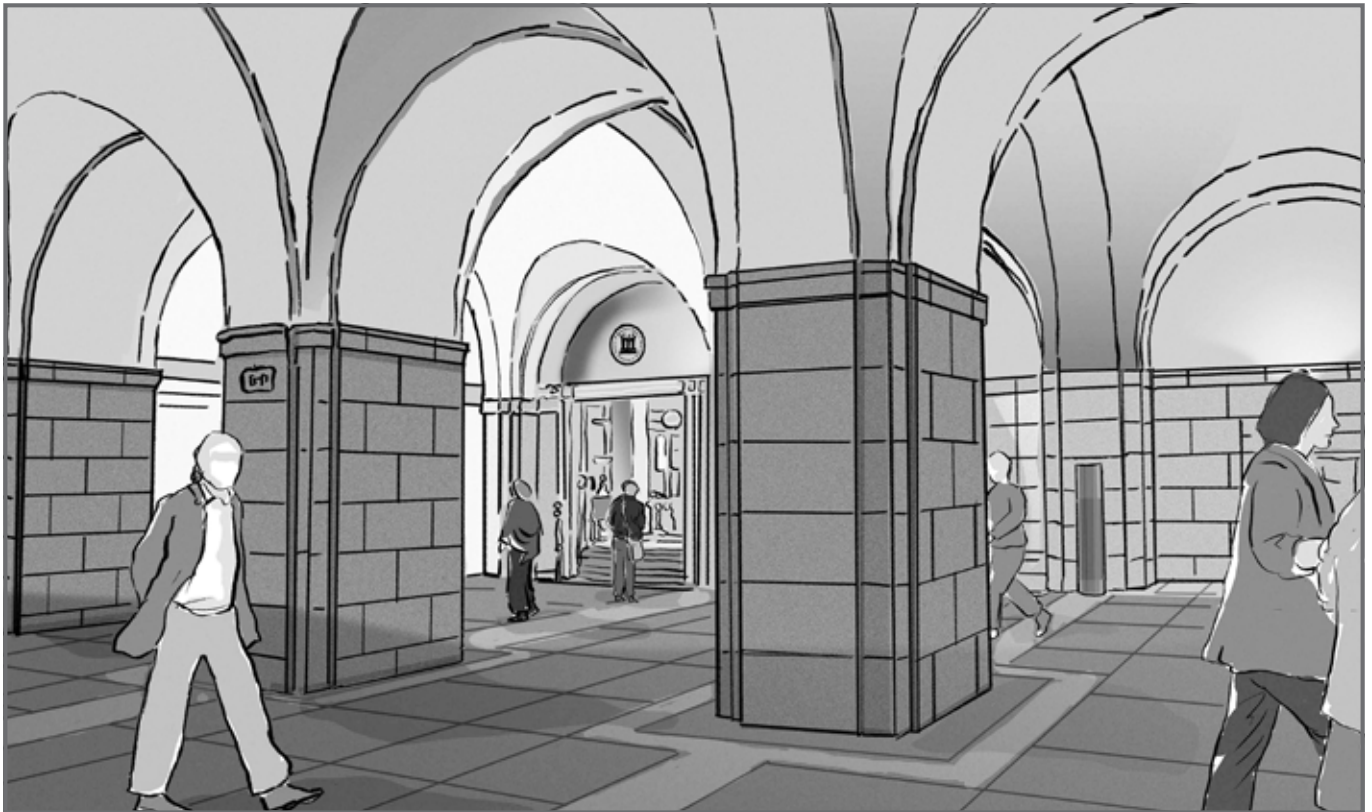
The concourse outside the entrance to the Western Cape Provincial Parliament
